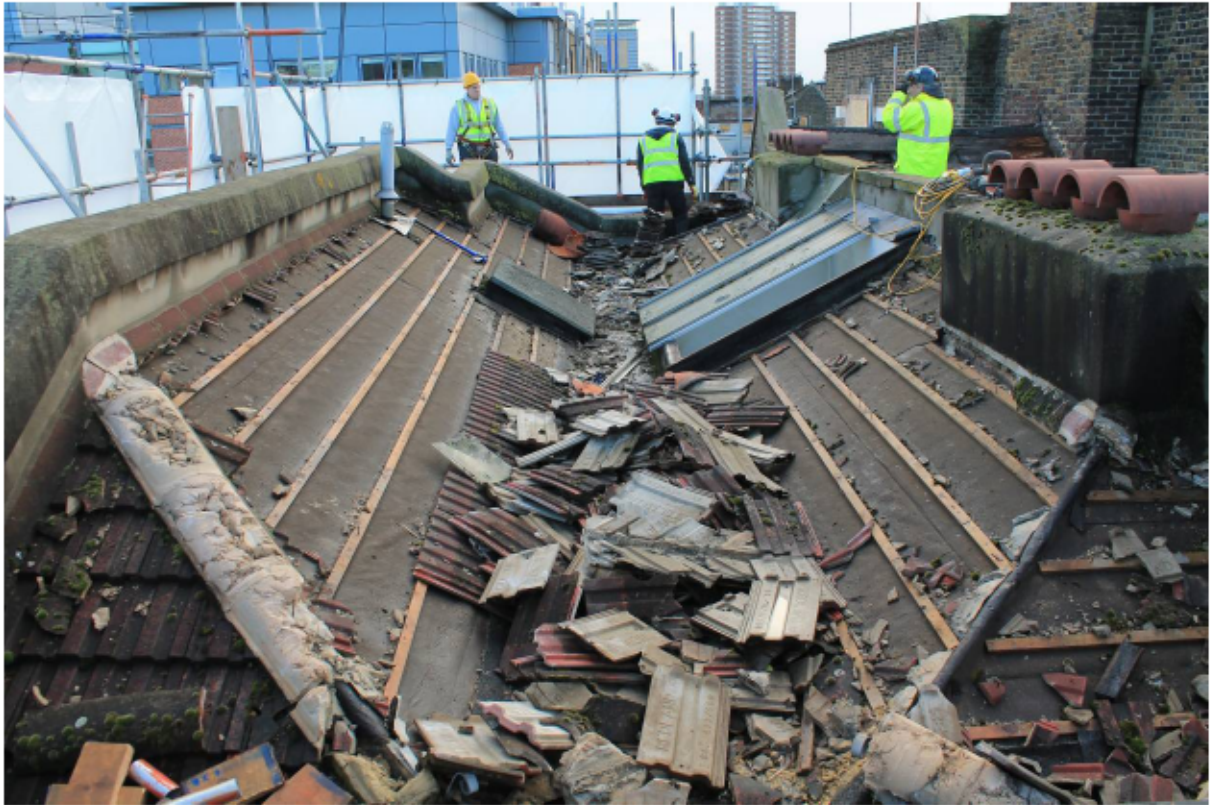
Roof over no. 141 Borough High Street during removal of the tiles, looking east
